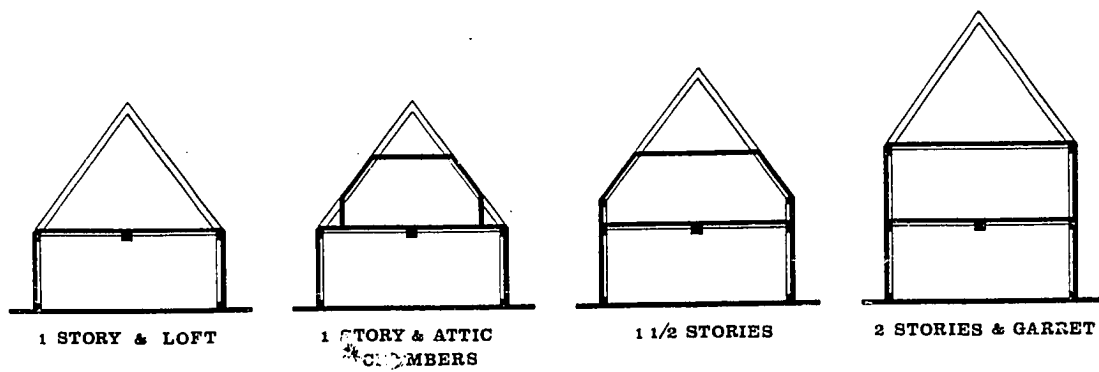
St. John's: Alternate Cross Sections illustrating the building as a one story, one and a half story, and two story structure.
